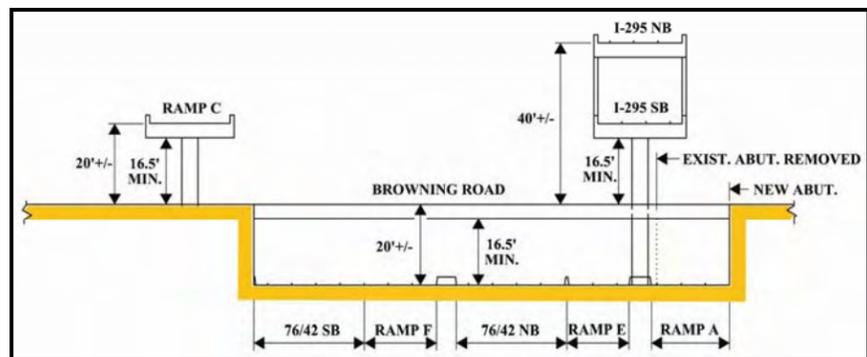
Section A-A at Browning Road (Alternative G)
